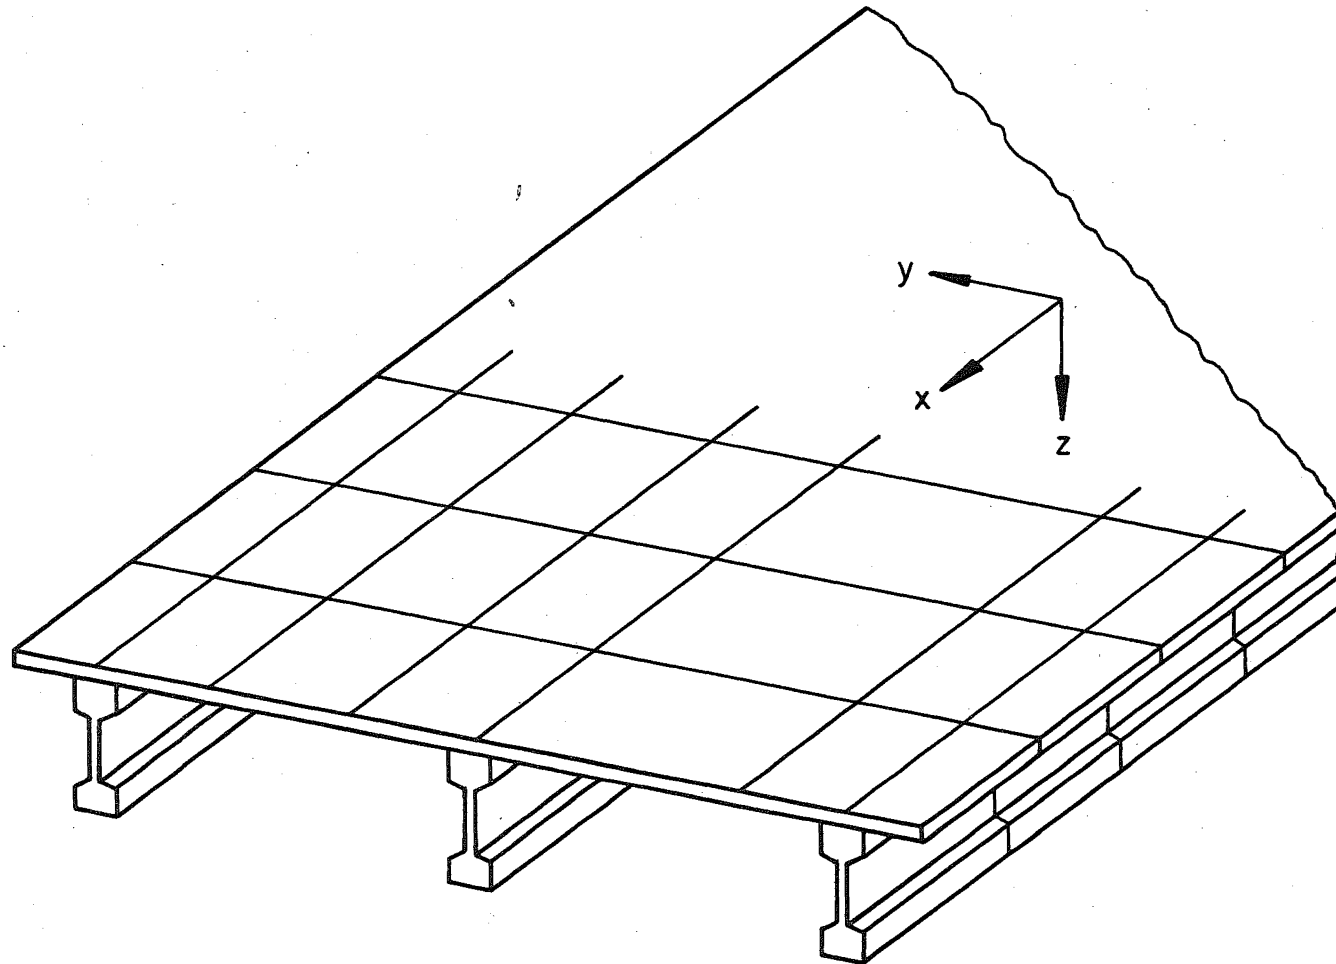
Typical Beam-Slab Type Bridge and its Structural Idealization by Rectangular Finite Elements
